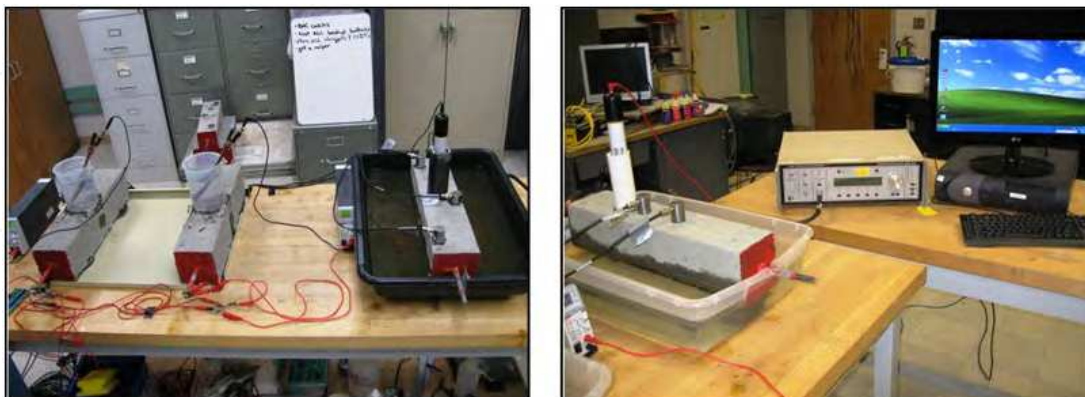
Test Setup for Accelerated Corrosion of Prestressed Concrete Specimens (after Mangual et al., 2011)
